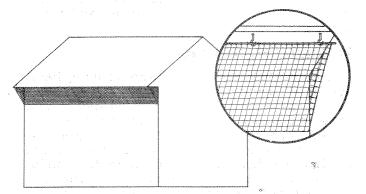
Plastic netting or wire mesh can be attached to a building from the outside edge of eave and angled back to the wood siding to exclude woodpeckers. Insert shows one method of attachment using hooks and wooden dowels. (Adapted from Woodpeckers [1983]), by Rex E. Marsh in R. M. Timm (ed.), Prevention and Control of Wildlife Damage, Cooperative Extension Service, University of Nebraska, Lincoln.
